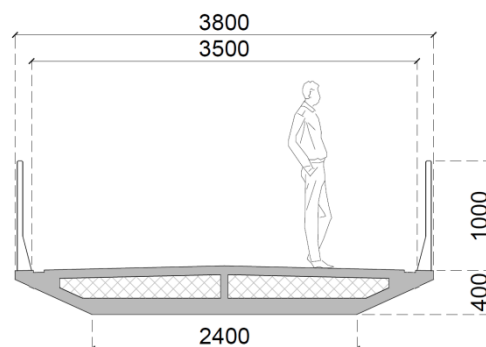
Cross-section of the bridge deck. The rib in the middle of the cross-section does not have a structural function. It is just for better control of concrete pouring in the bottom slab.
